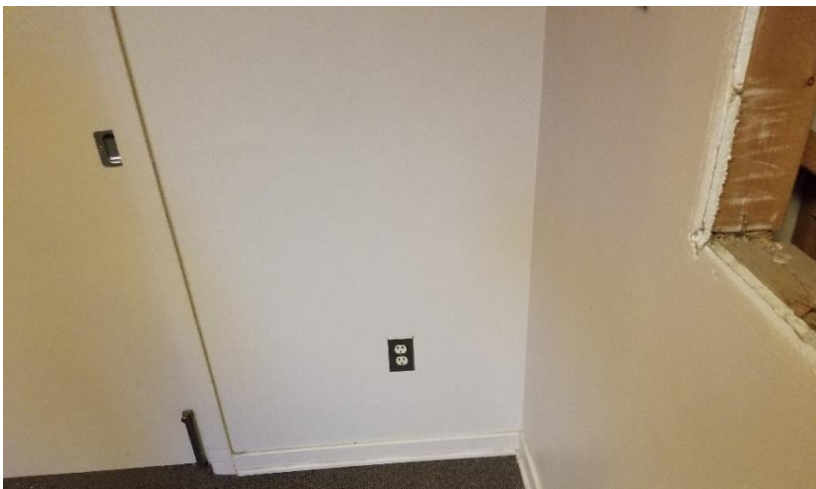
A typical view of an asbestos-containing drywall joint compound was observed throughout the subject building.
